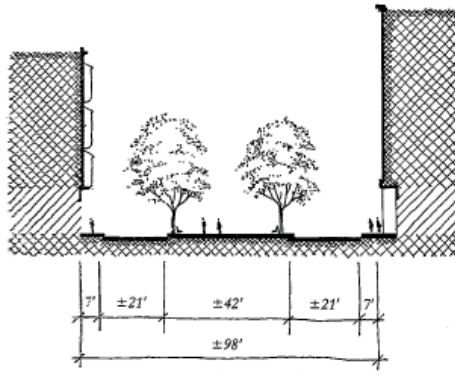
Section of Avenue, Monument Avenue, Virginia, Allan Jacobs, Great streets, 1993)
